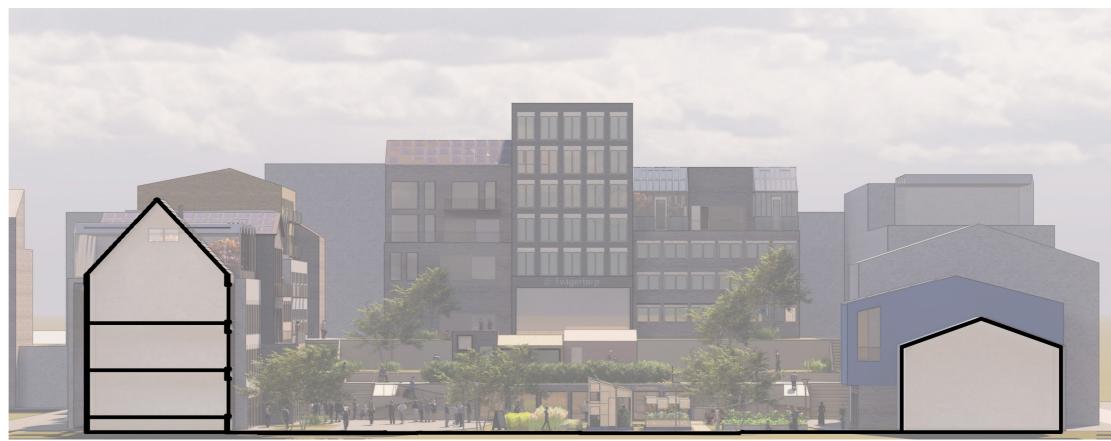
Section A-A in the live-work module (see site plan in page 126)
